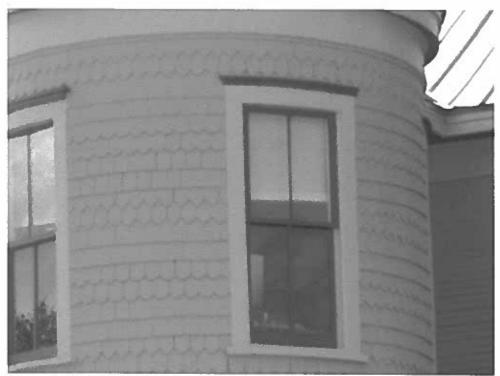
Window of 2nd floor turret facing northeast. Panes were broken and window was pain shut. Now restored and operational.
